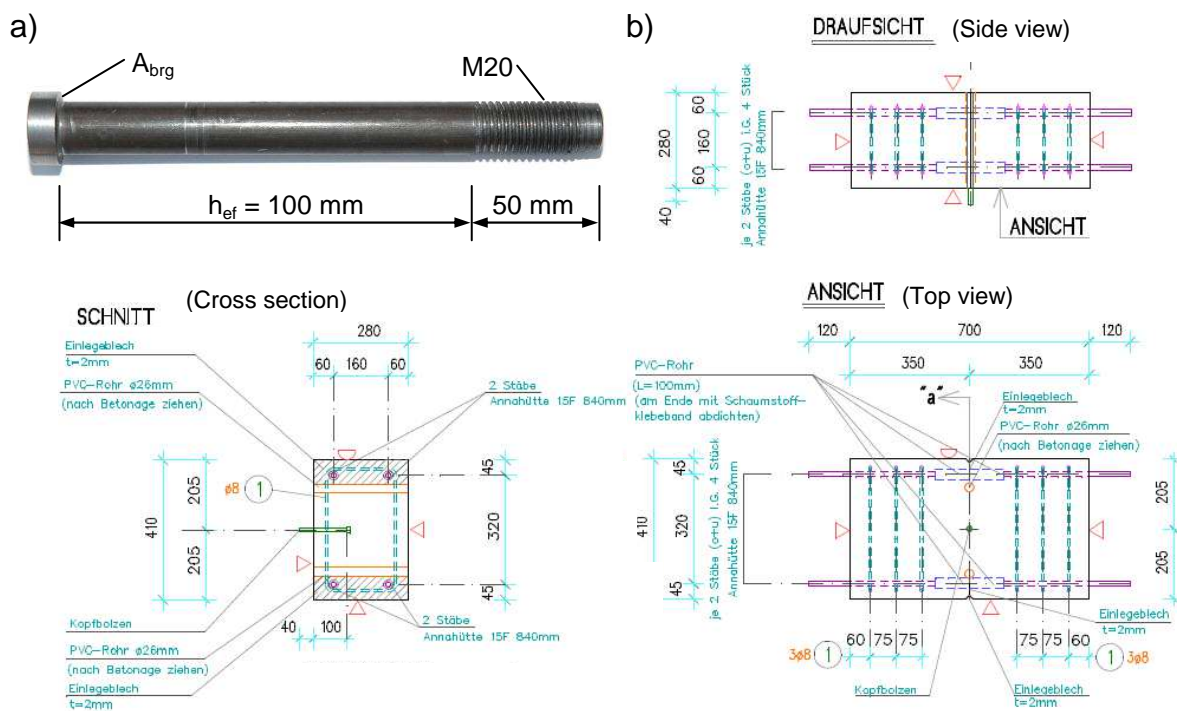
a) Photograph of modified headed bolt; b) Special concrete test specimens with cast-in headed bolt used for simultaneous load and crack cycling tests
